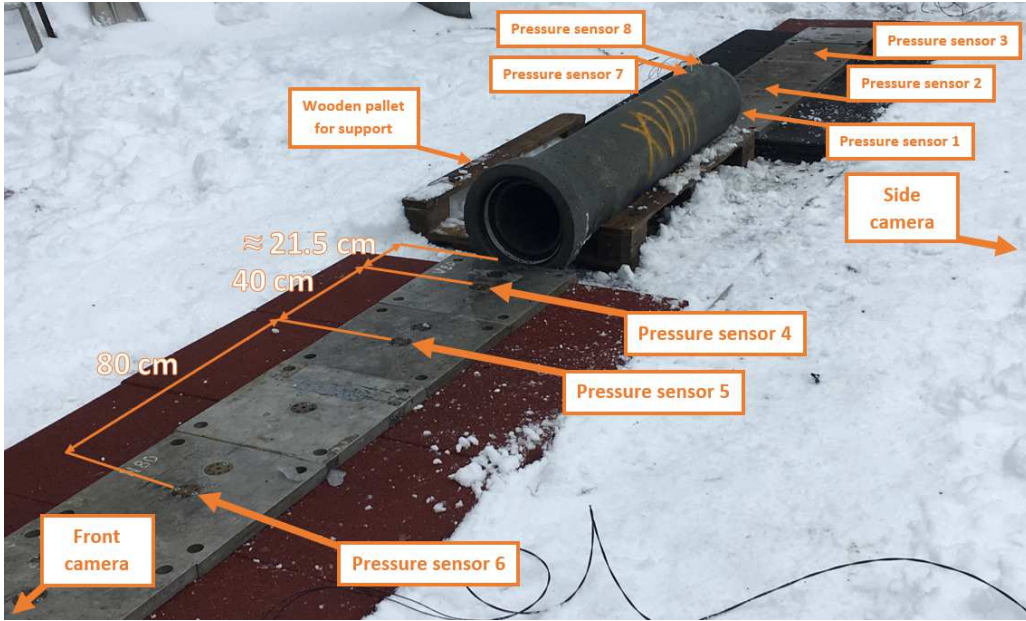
Experimental setup of new testing of concrete pipes subjected to blast loading.
